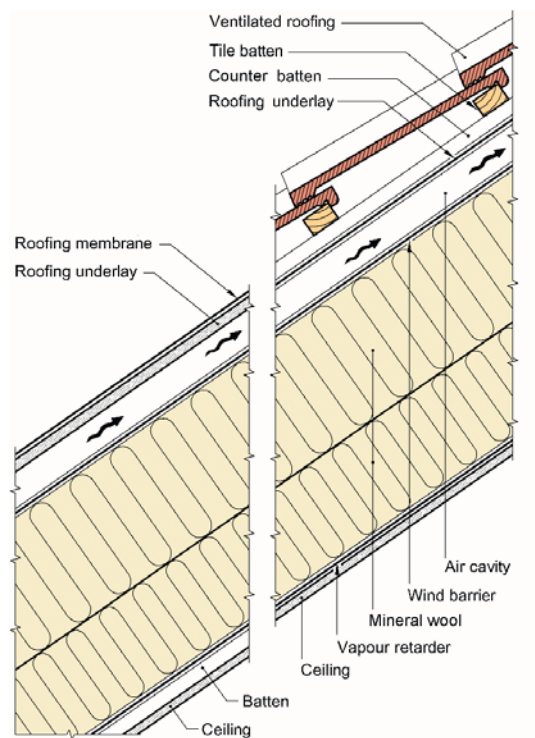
Pitched wooden roof Type A with separate wind barrier and underlayer roofing.
